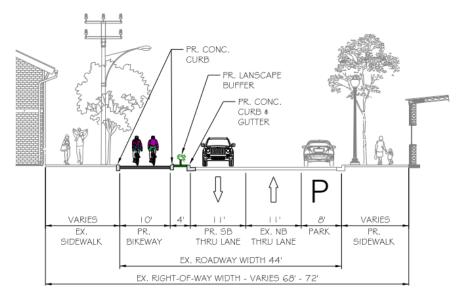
Typical Section between Gist Avenue and Wayne Avenue
